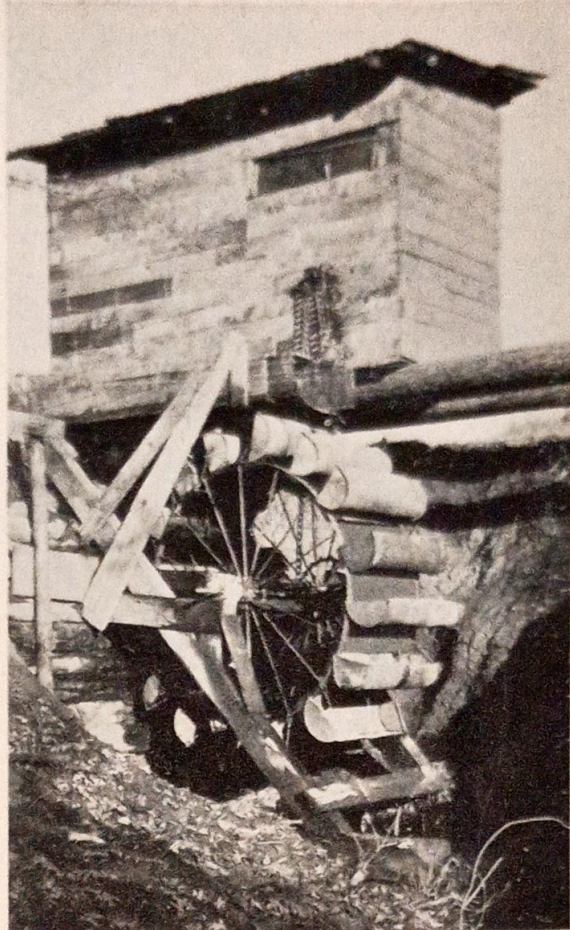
Overshot Wheel Mounted and Ready to Take the Water.
